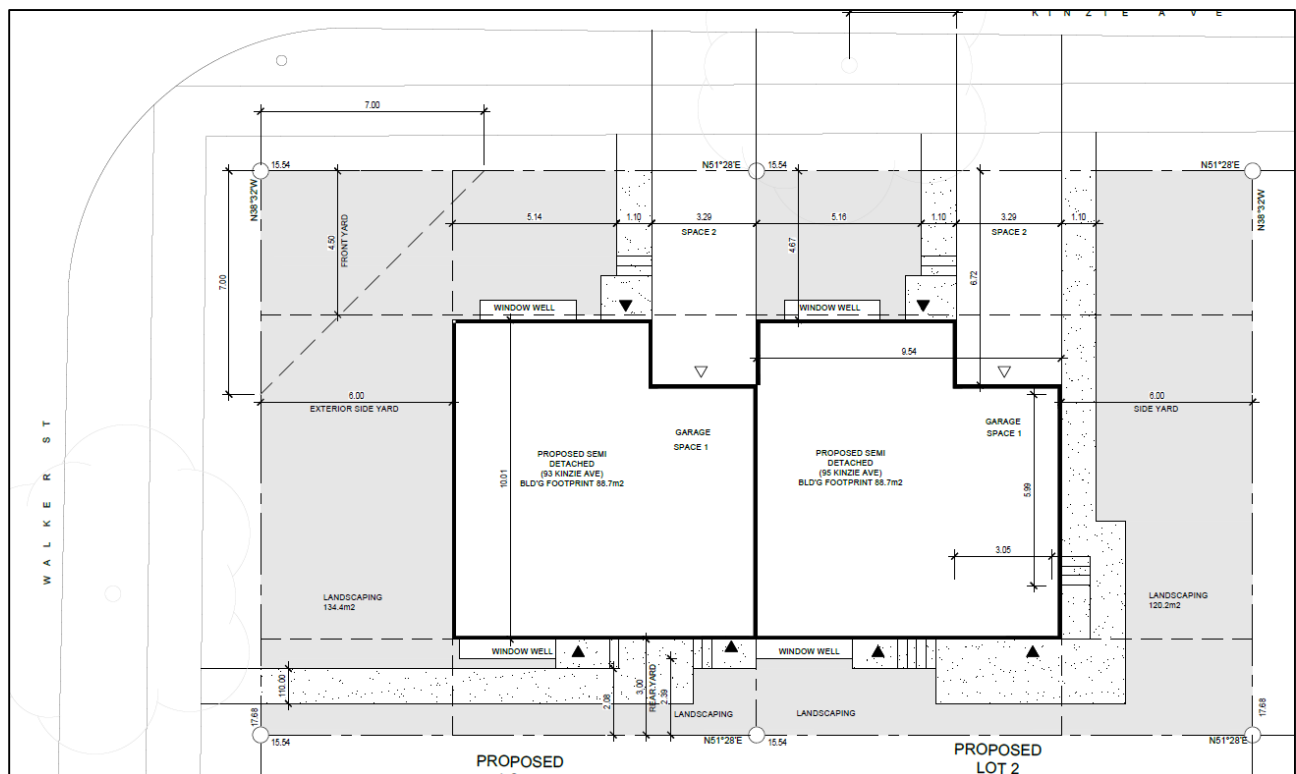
Concept Plan (Revised Driveway to be outside of CVT)
